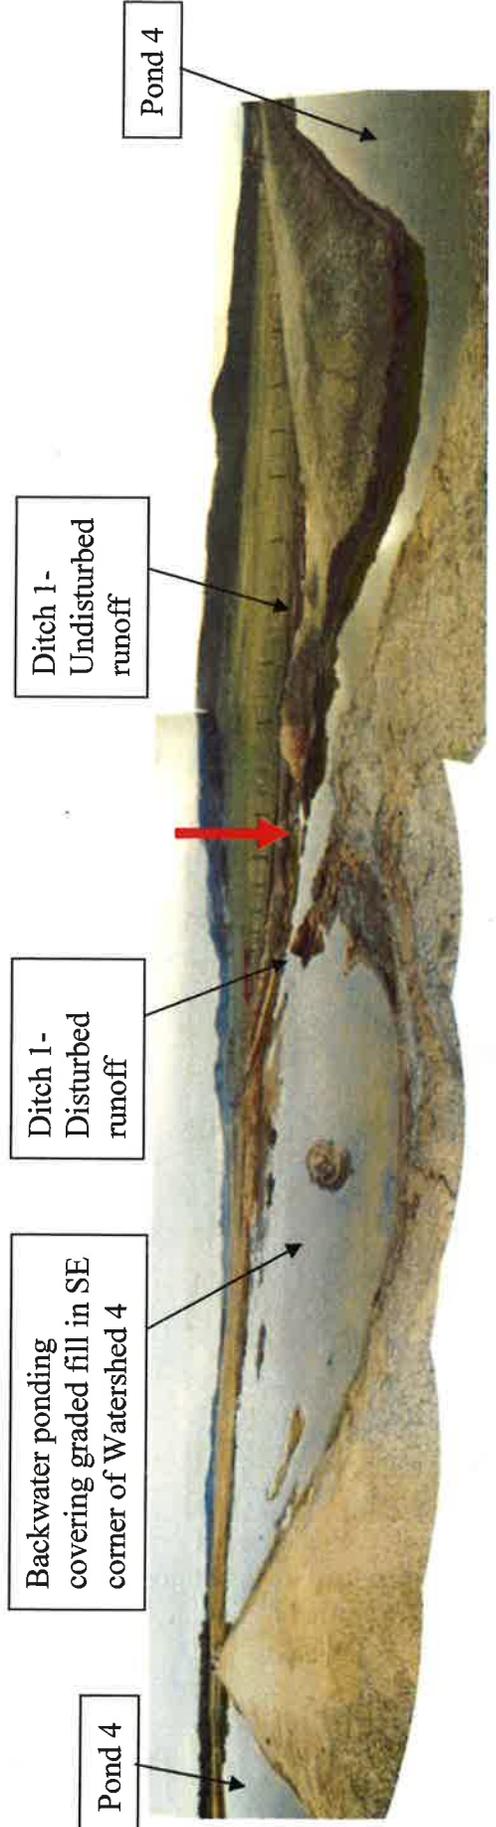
March 24th, 2015 inspection. ~300° panoramic photo of backwater pond outside of Sediment Pond 4. Red arrow points to failure point of Ditch 1 where disturbed area runoff exited the site via the undisturbed ditch.
